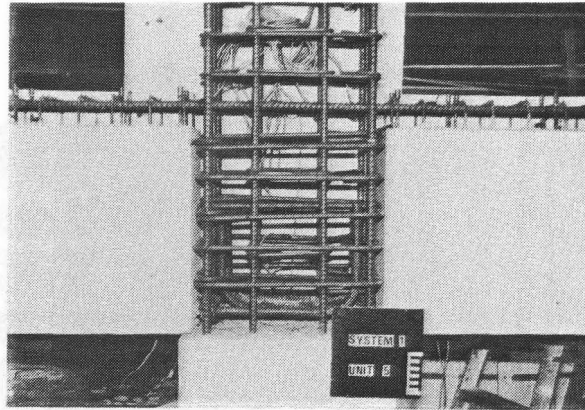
Arrangement of the Cast in Place Connection of Unit 5.
